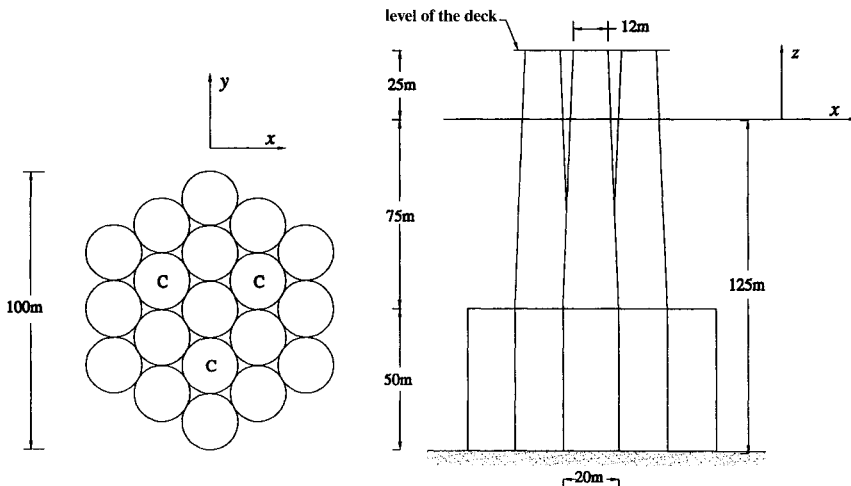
Plan and front view of a gravity offshore platform; the positions of the columns in the plan are denoted by letter C.
